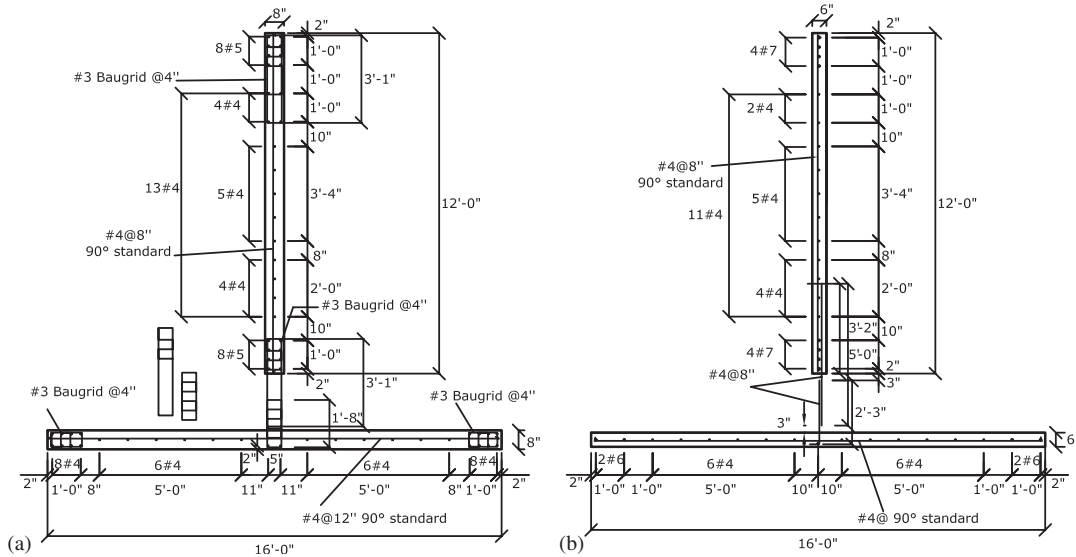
Reinforcement details for the wall specimen: (a) first level and (b) levels 2–6 (U.S. customary units).
